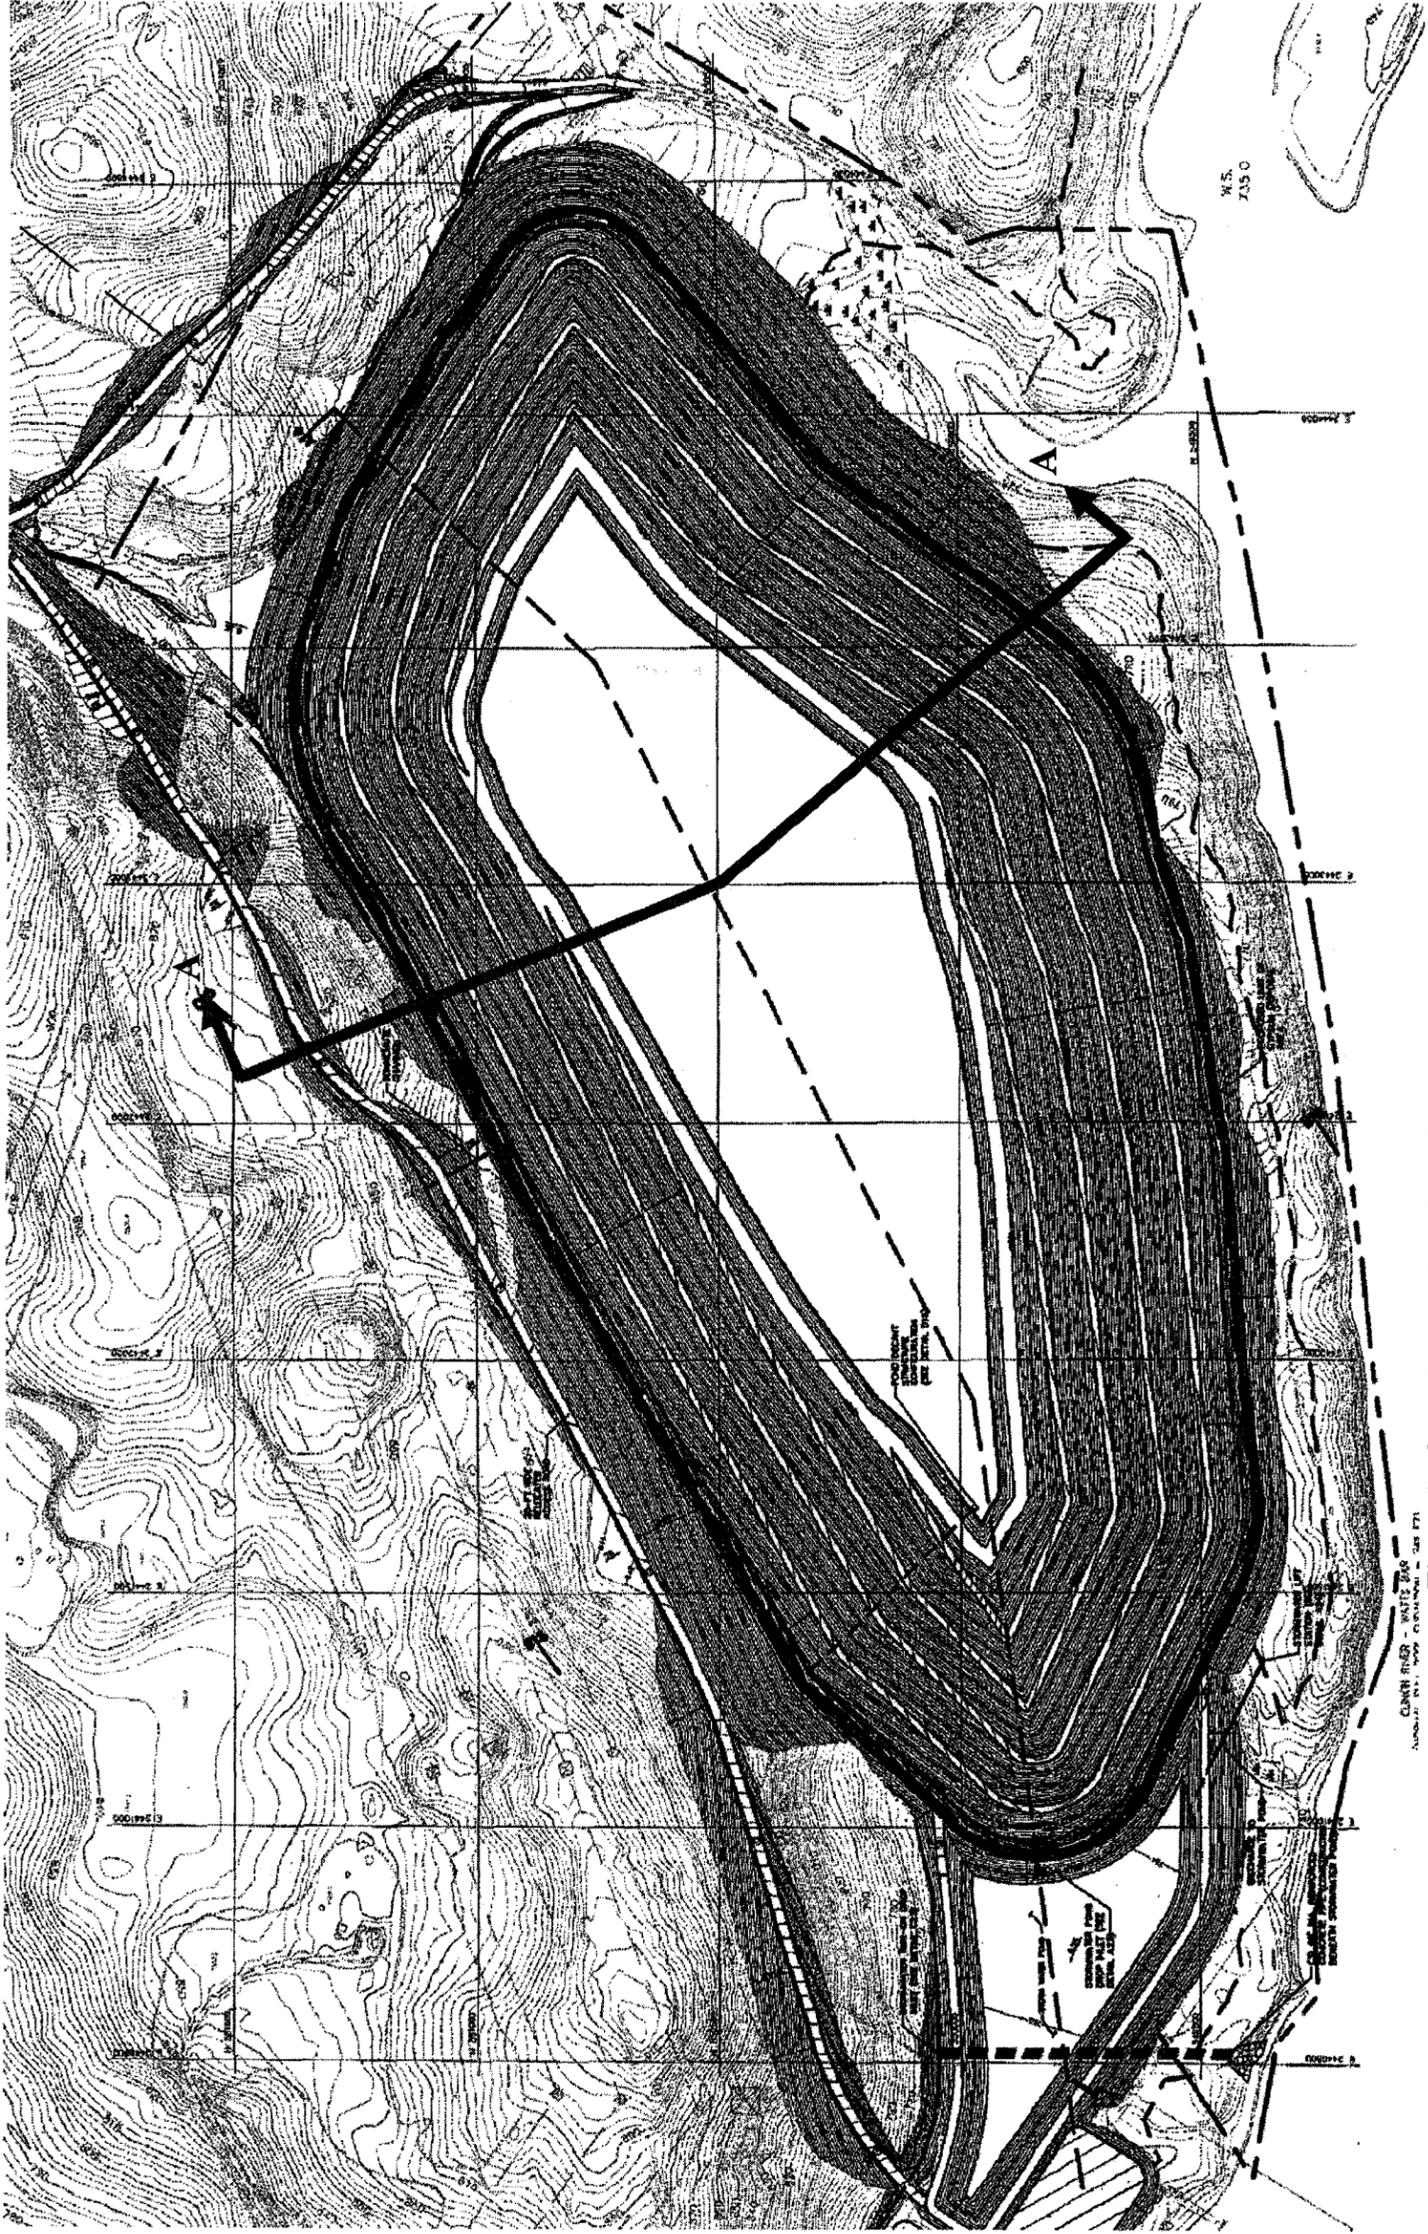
Cross Section Location with respect to Wet Stack Grading Plan
